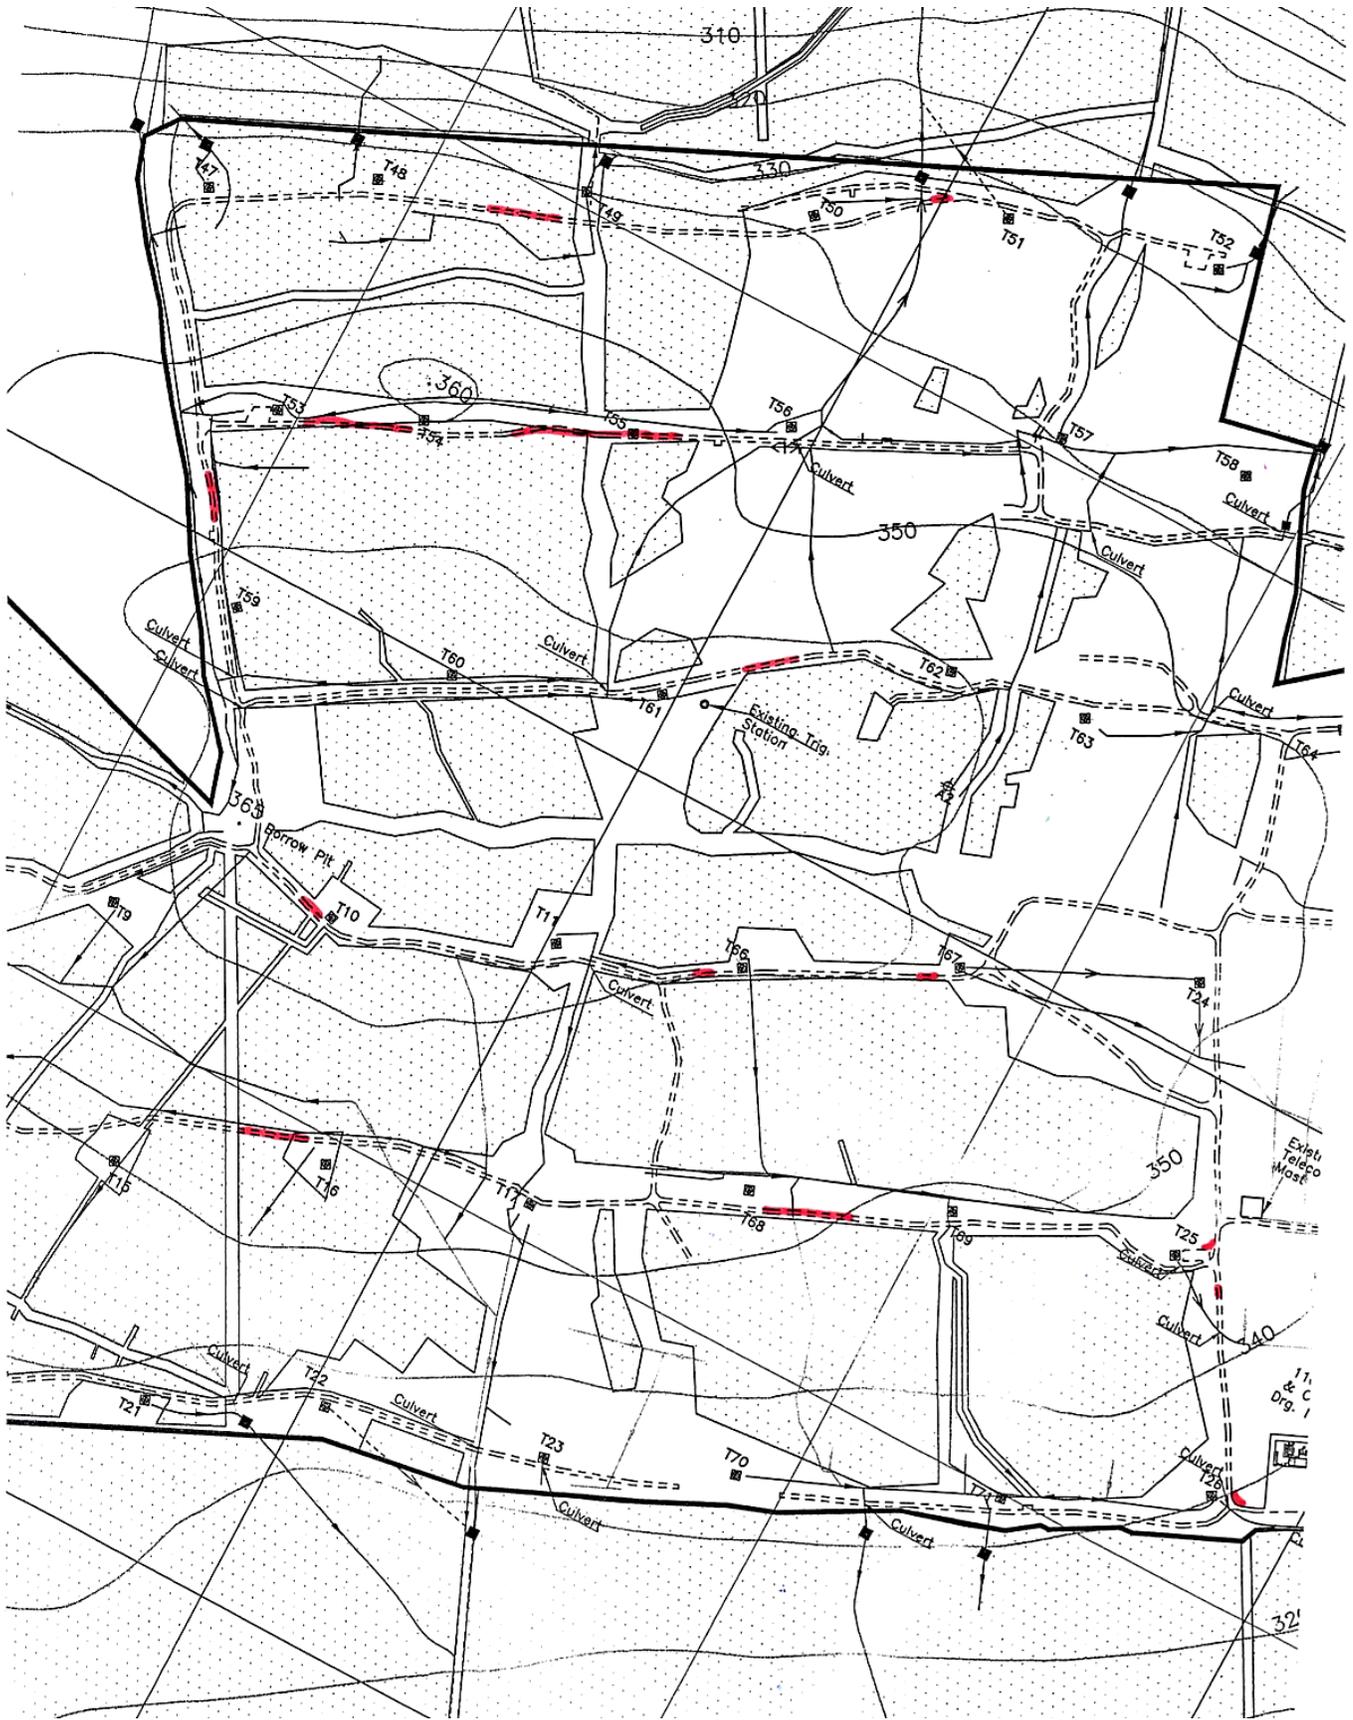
Sections of floating road classified as poor in central section of site (marked in red)
